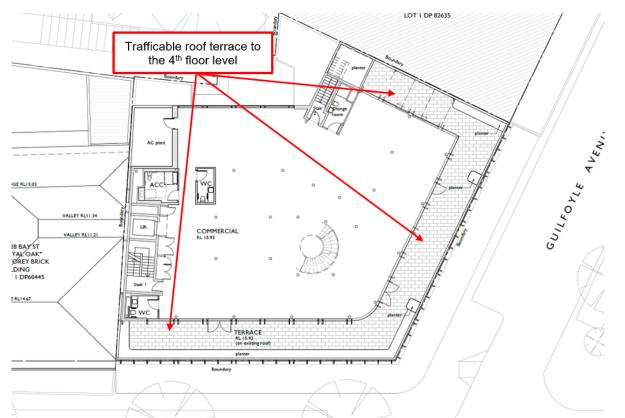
Floor plan of the 4th floor level showing the extent and location of the trafficable terrace to the commercial offices
